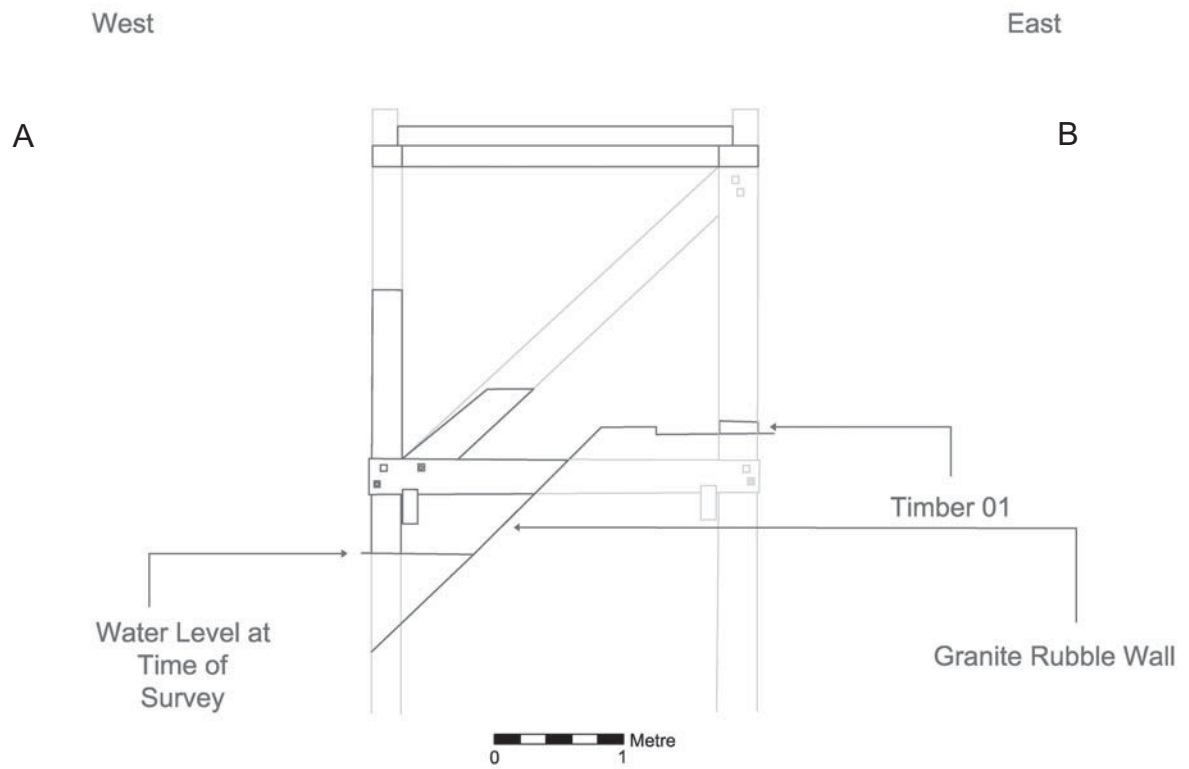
Elevation of Walkway (Black Actual, Grey Conjecture).
